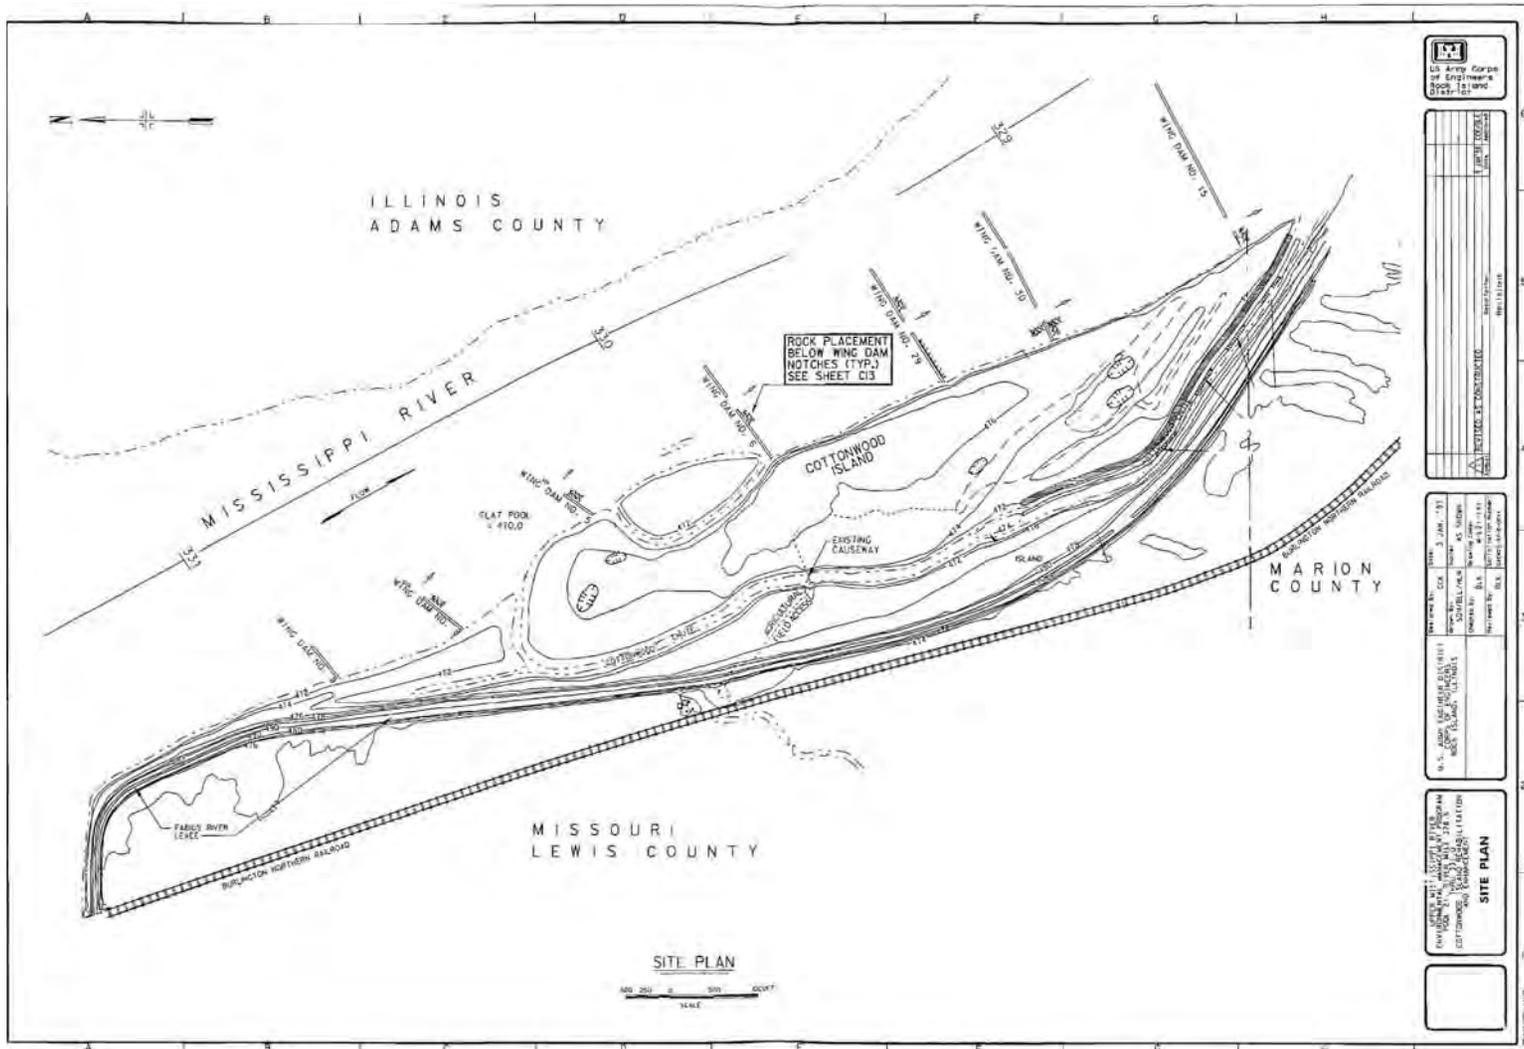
Cottonwood Island HREP; Wing Dam Notch Site Plan
